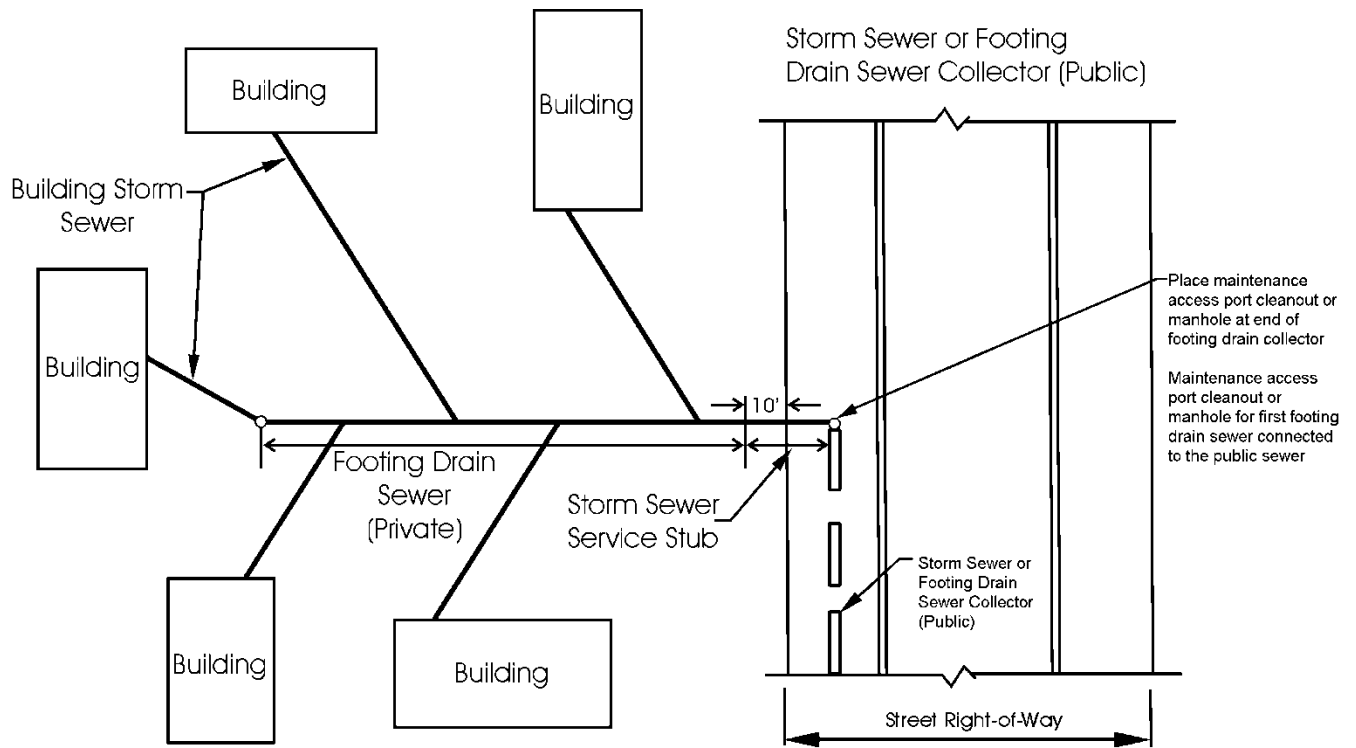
EXAMPLE OF PUBLIC AND PRIVATE STORM SEWERS
